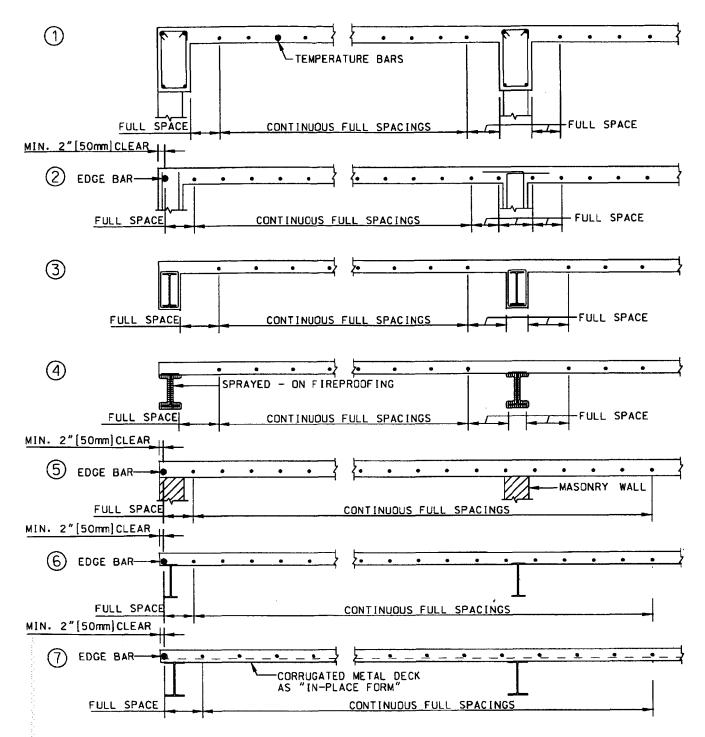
(b)—Location of first bar designated only by size and spacing, one-way slab shrinkage and temperature reinforcing bars.
